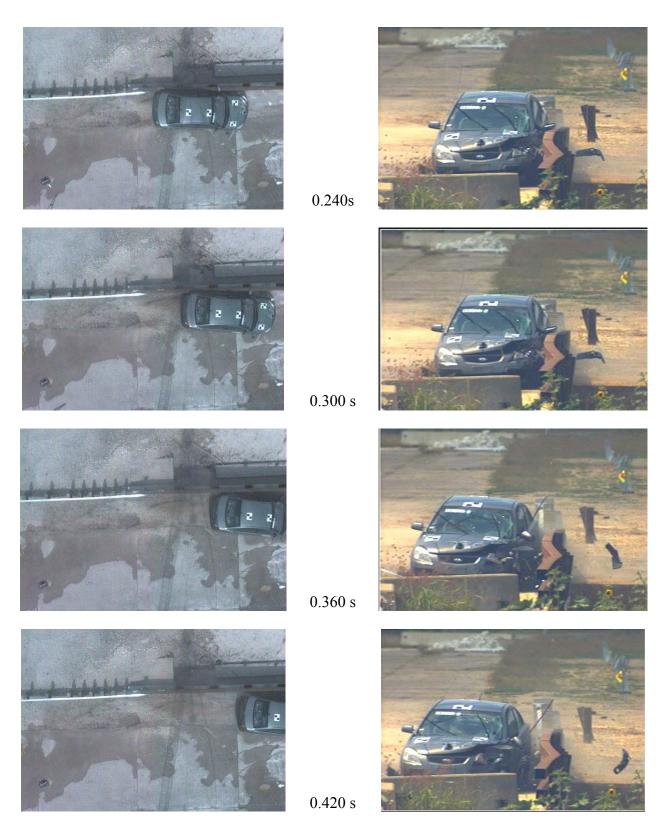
Sequential Photographs for Test No. 490022-6 (Overhead and Frontal Views) (continued).
